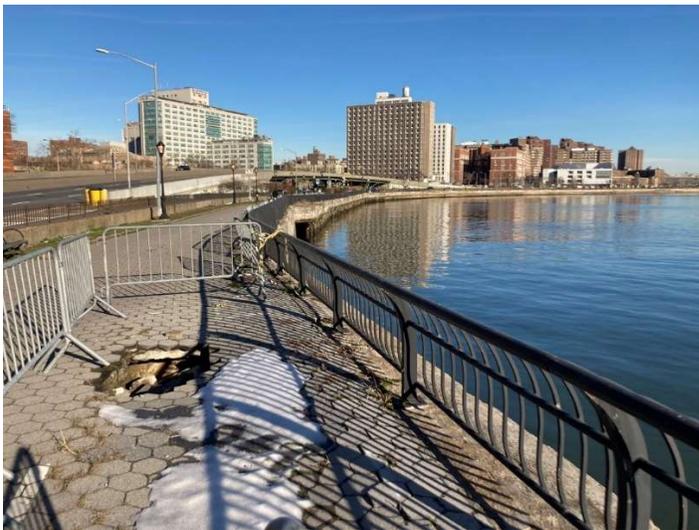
Looking north from 93rd street, typical sink hole, one of many. See "A" on Keymap
